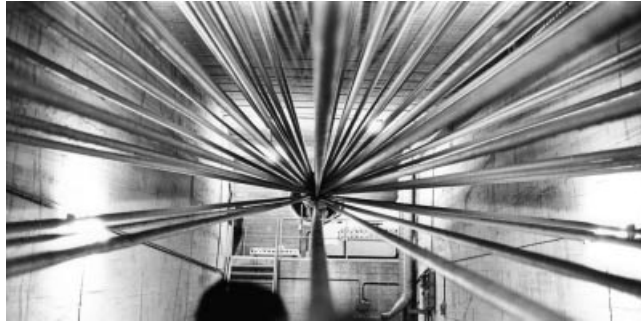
Main cable anchorage in rock (Firth of Forth Suspension Bridge)
